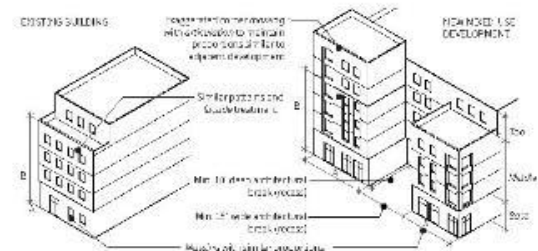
Designing new projects to be proportional to the form and scale of surrounding developments.
